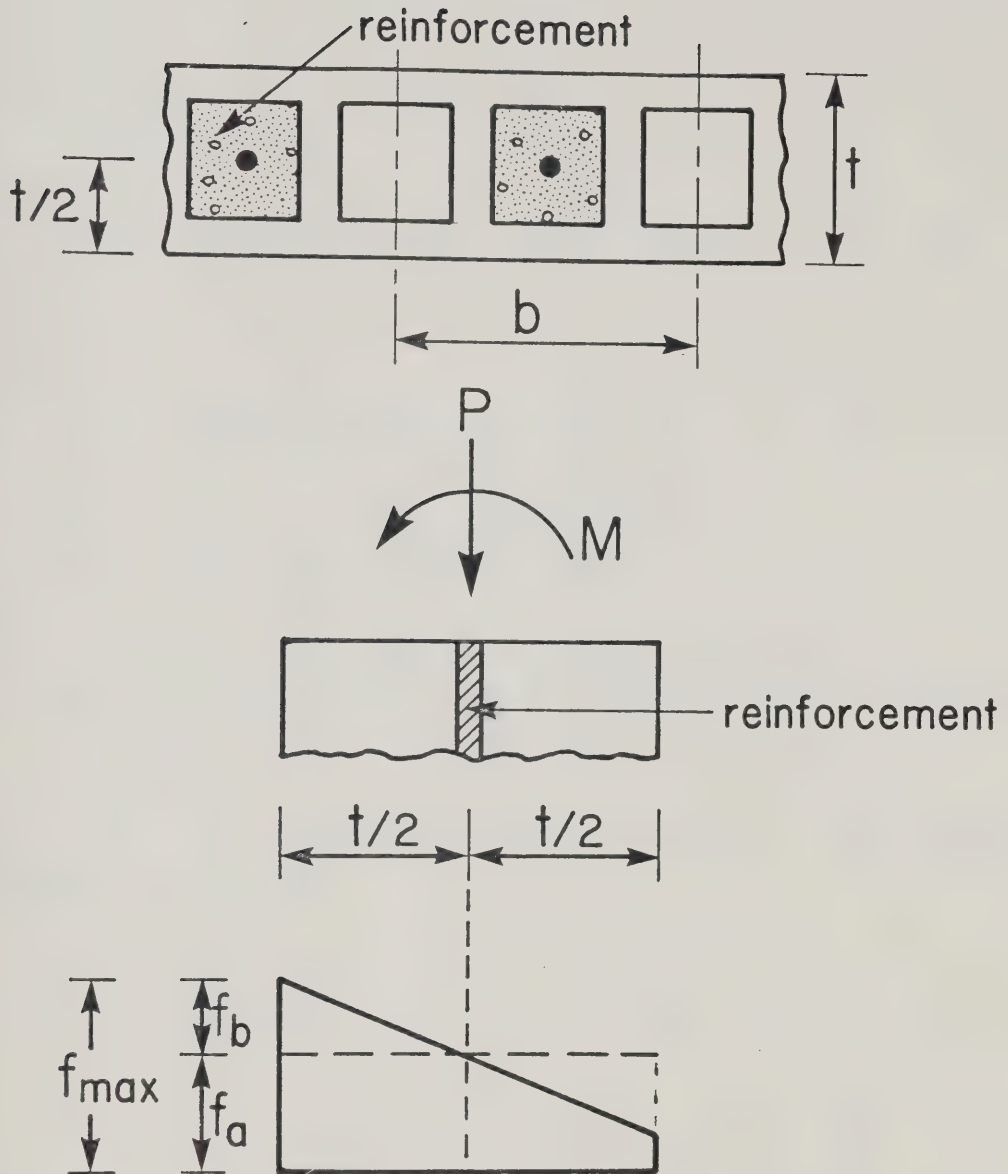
Stress Due to Axial Load and Moment Acting on a Reinforced Wall Section with Total Cross-Section in Compression
